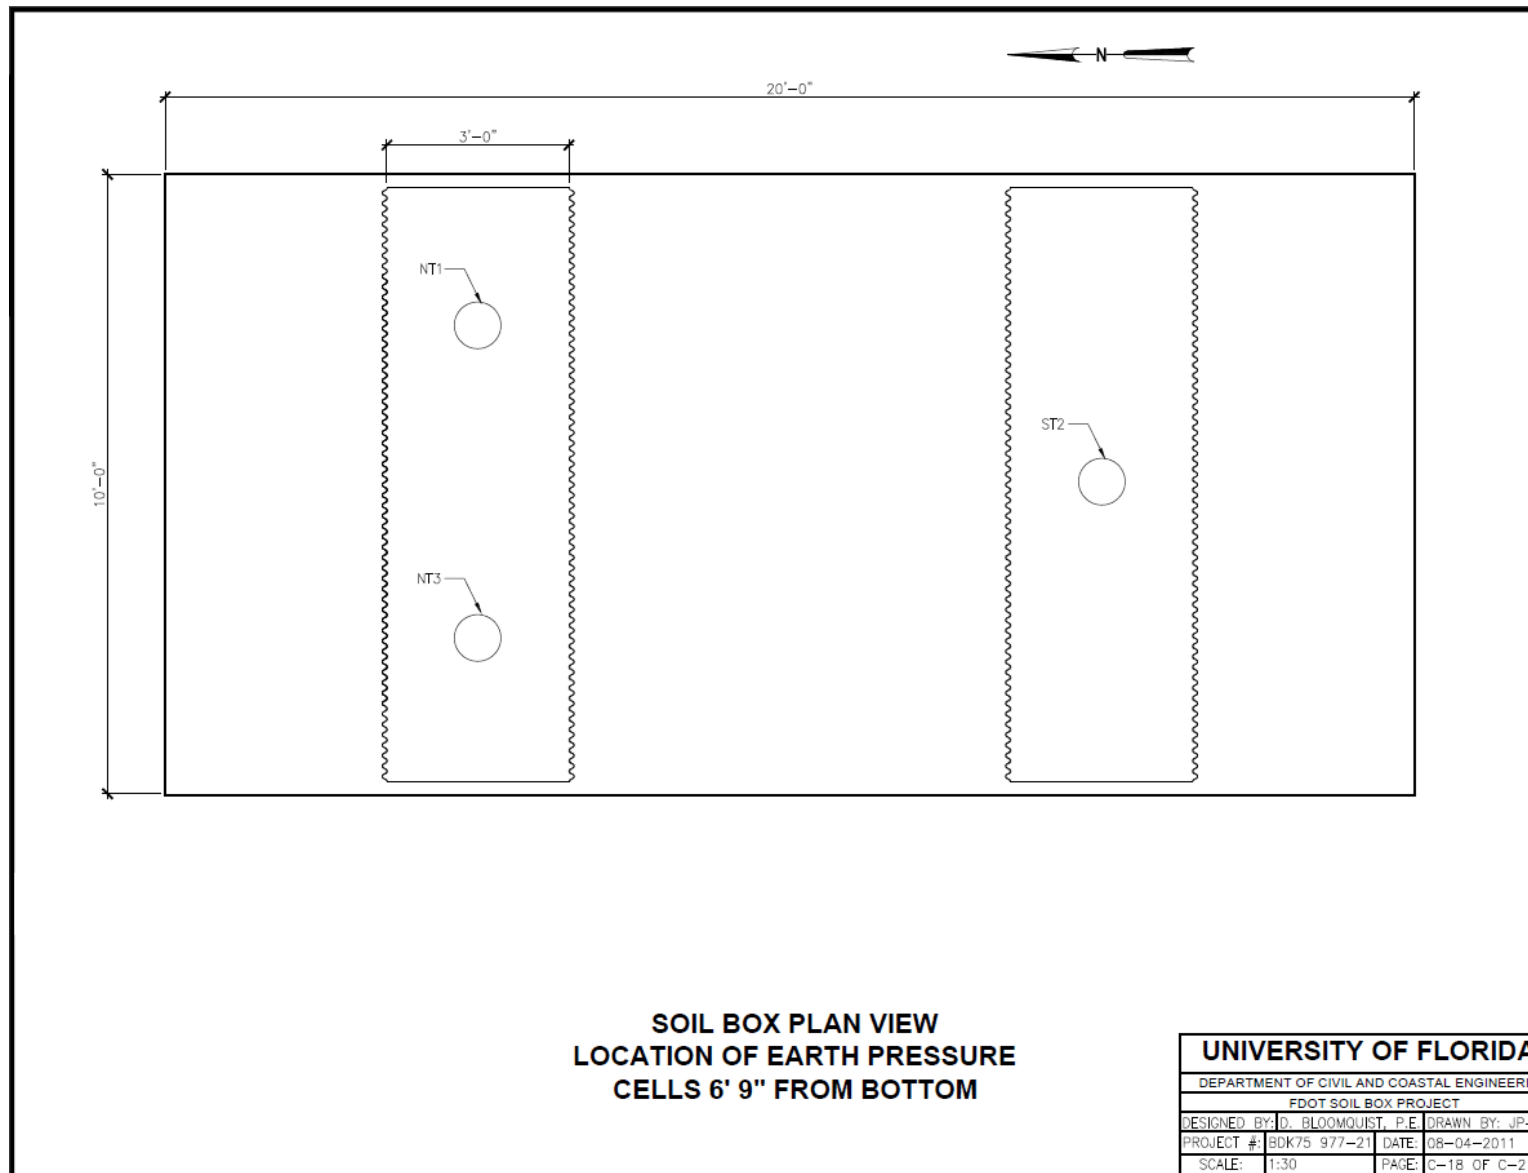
Earth pressure cell layout for steel pipe test 6'-9" from bottom of Soil Box.
